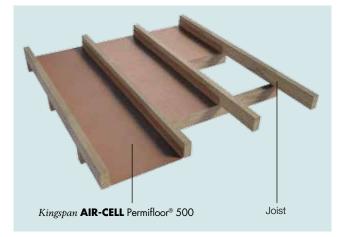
Pre-cut *Kingspan* AIR-CELL Permifloor[®] 500 installed between floor joists
